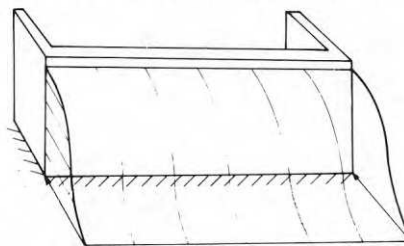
Foundation wall with adjoining wing walls. Top edge unsupported. Assumed loading due to earth pressure.
